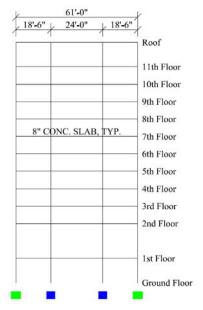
Typical frame resisting lateral loads in N/S direction (See column legend for sizes)
